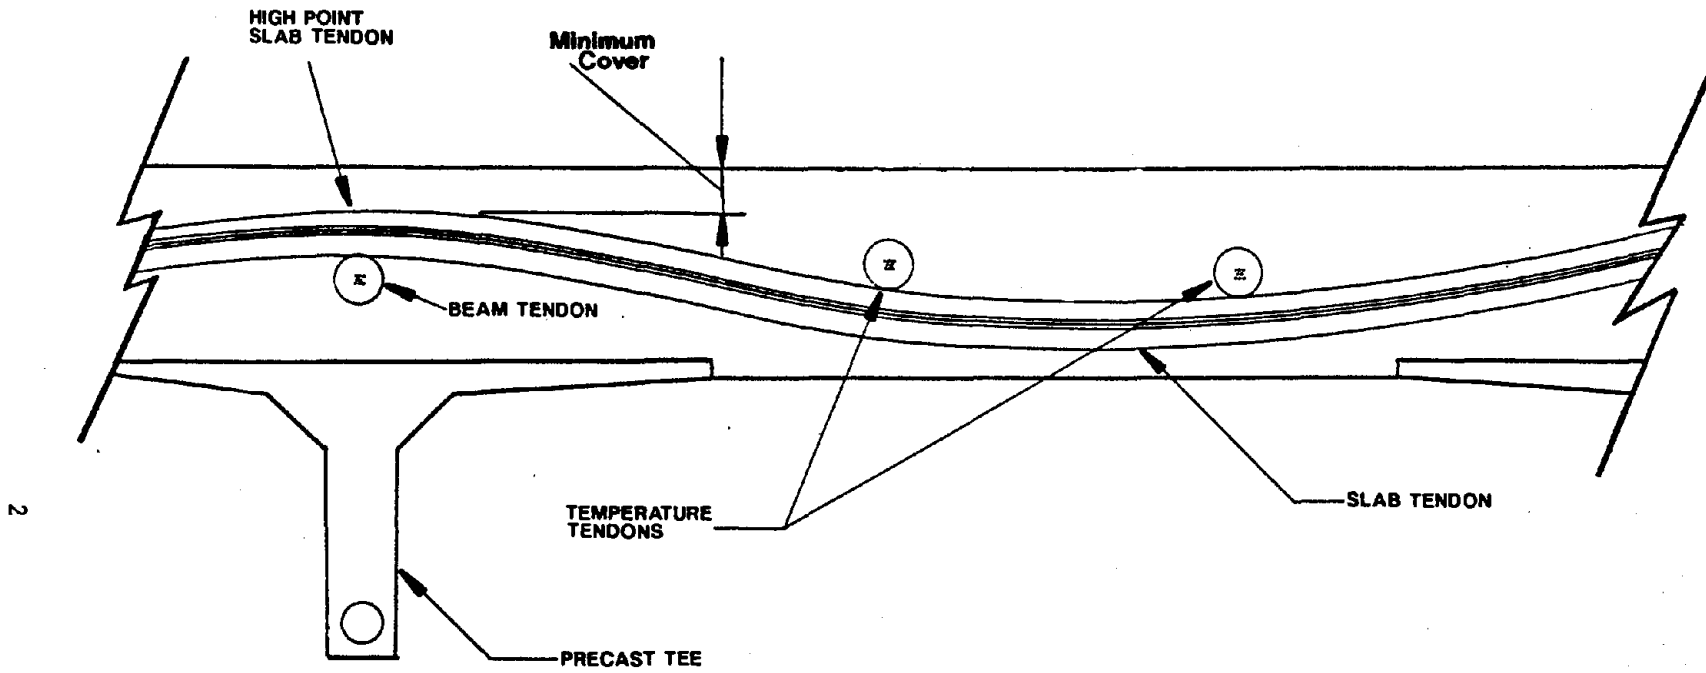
Section view of a typical two-way bonded post-tensioned deck slab on precast tees.
